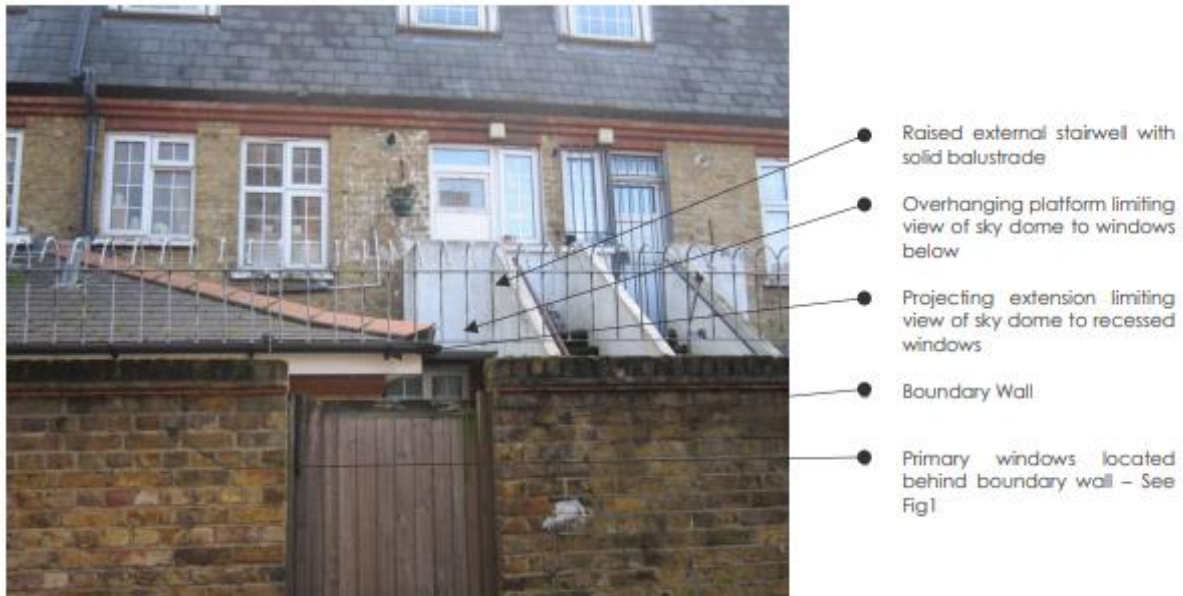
Existing site constrains, 1-14 Vaughan Estate
